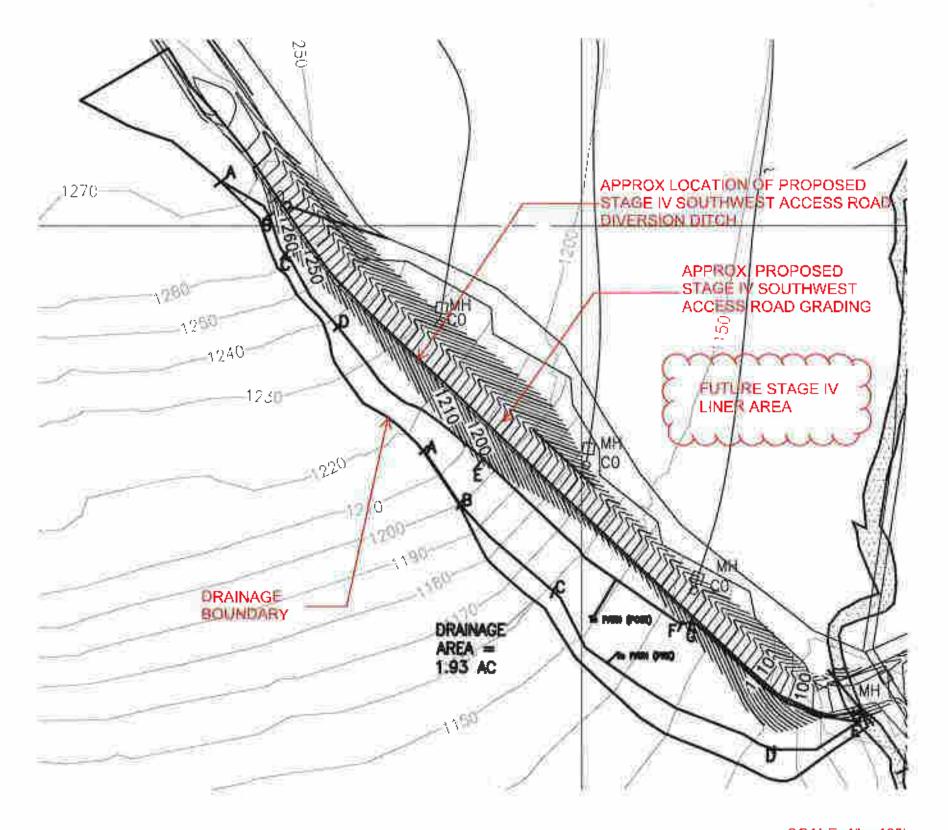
PROPOSED CULVERTS 18 AND 19 DRAINAGE WORKSHEET
